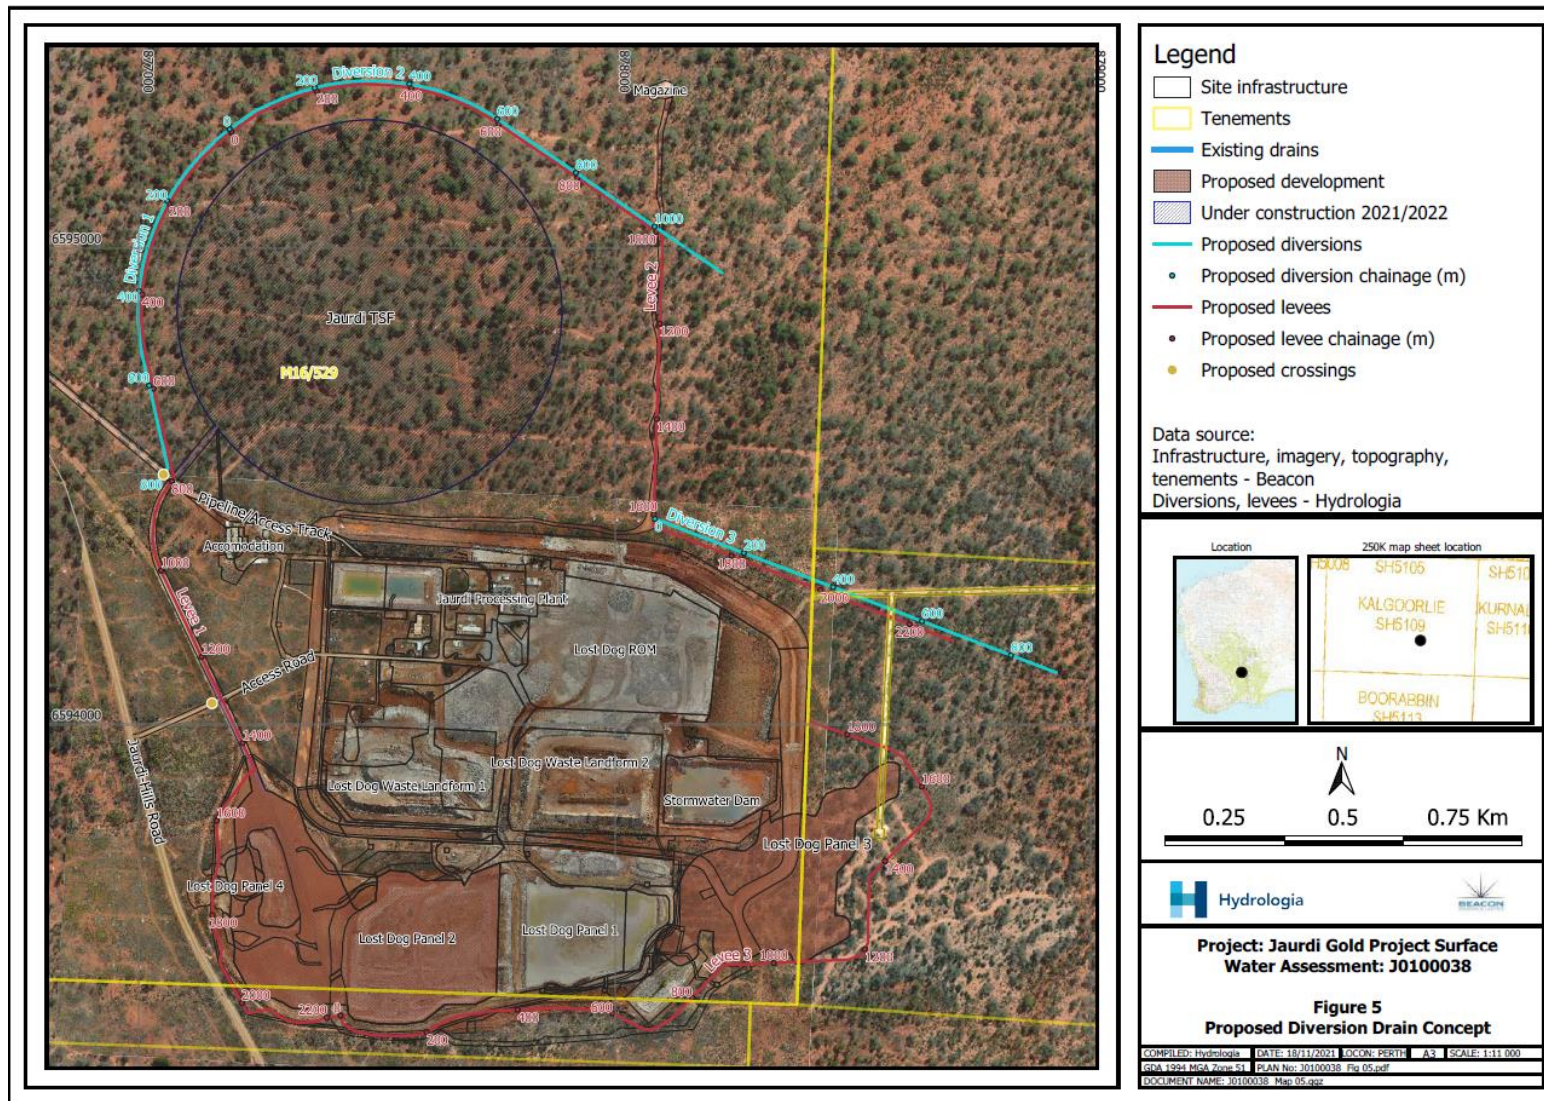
Stormwater levees and diversion drains surrounding the Jaurdi Prescribed Premises.
